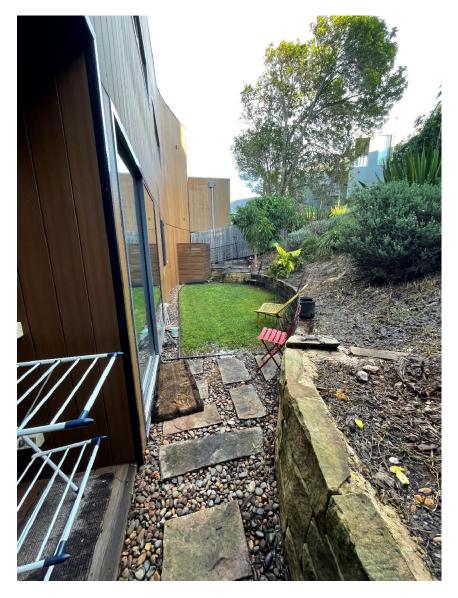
Proposed swimming pool location to rear of image with existing stone wall to be renovated in the foreground.
